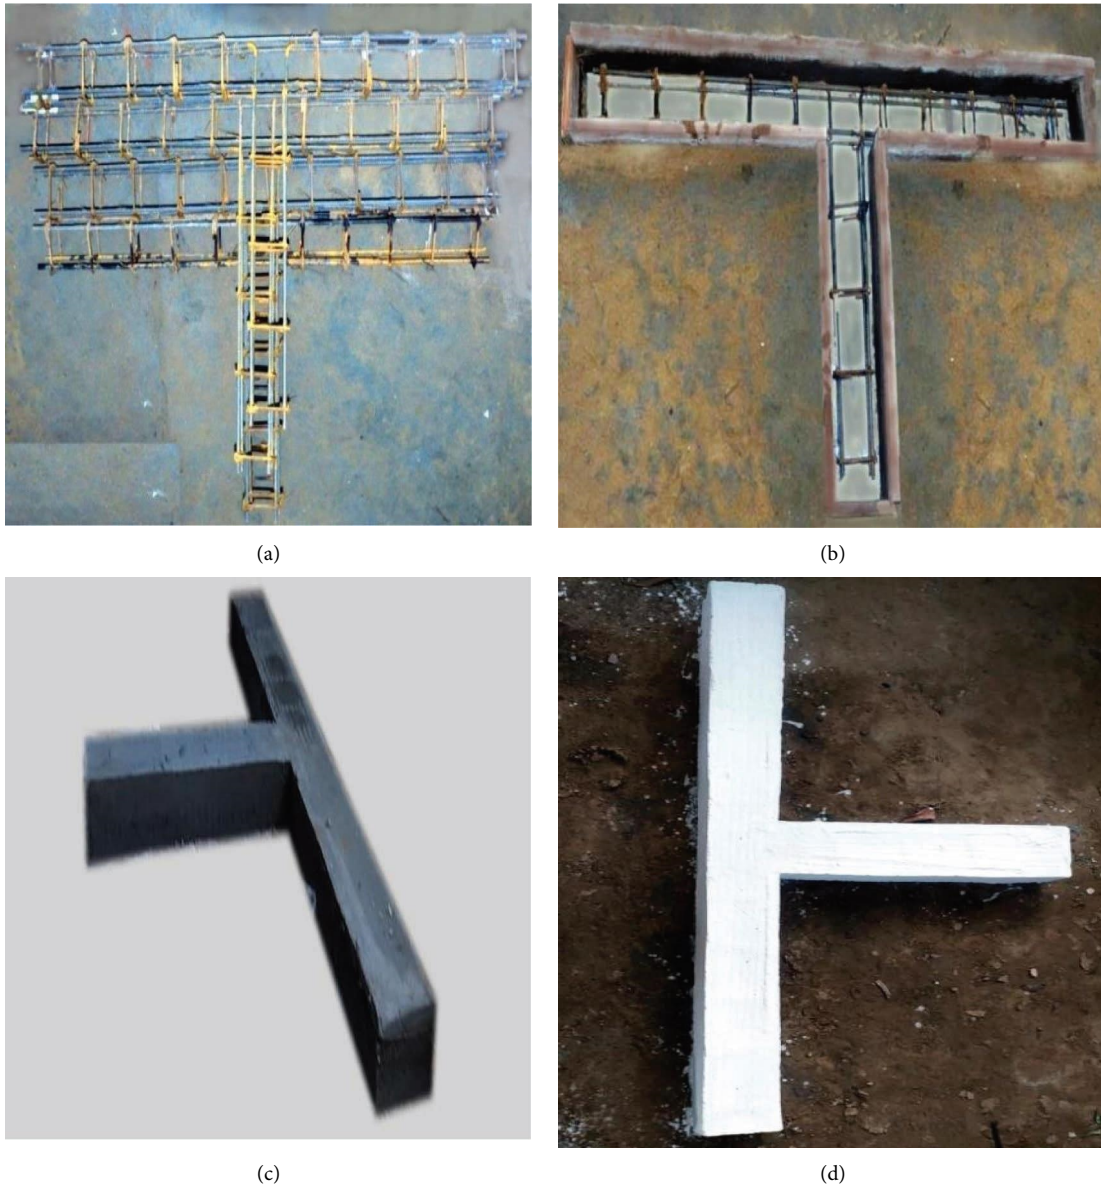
Preparations of test specimen: (a) steel reinforcement cages, (b) wood flag and steel reinforcement cages, (c) casted specimen, and (d) white washing specimen.
